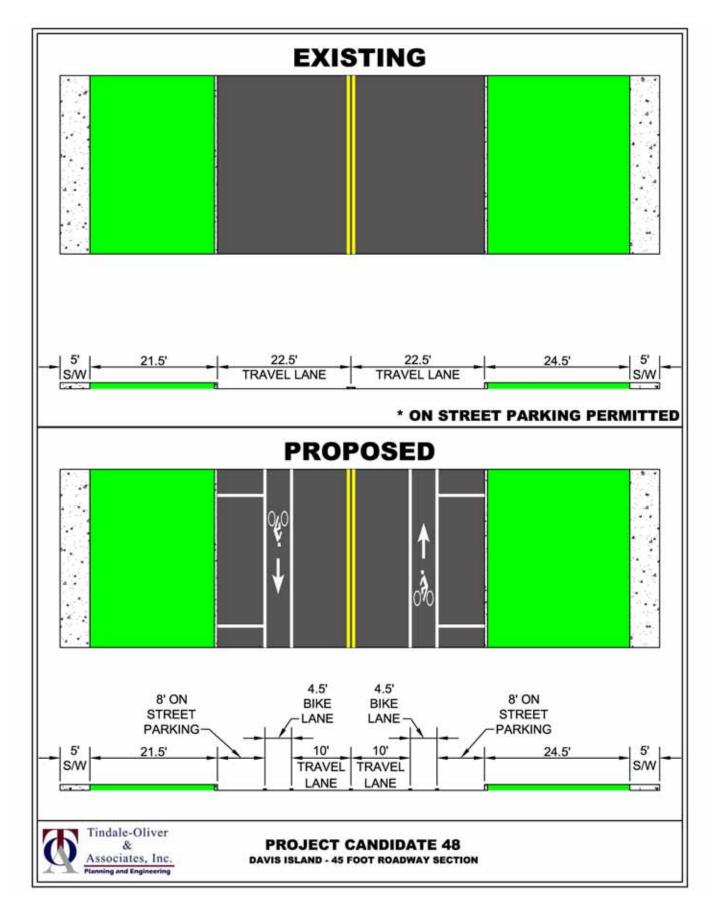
B: Davis Island Proposed Improvements – 45-foot Roadway Section
